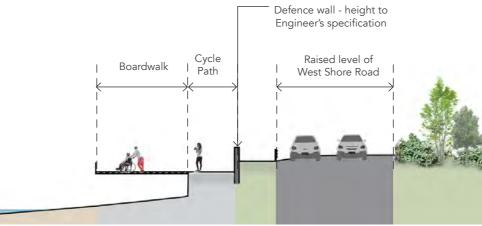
Section B-B through cantilevered walkway, diagram by LUC Indicative proposal subject to consultation with HRA and SEA.
